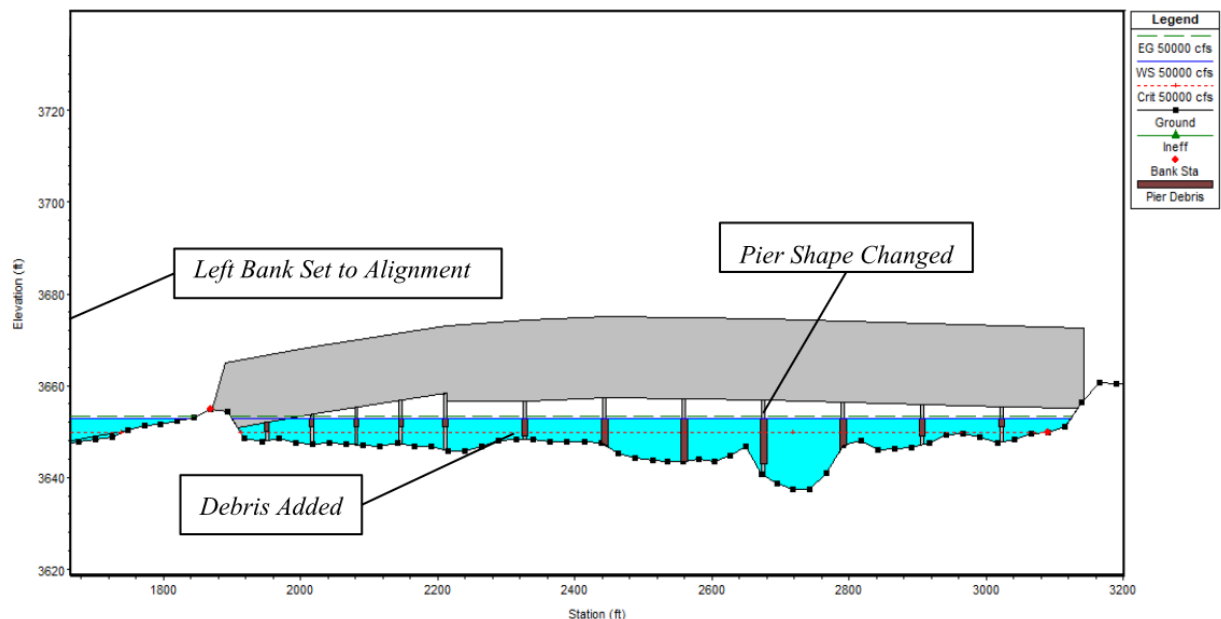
Bridge with Left Bank Set to Proposed Highway Alignment
